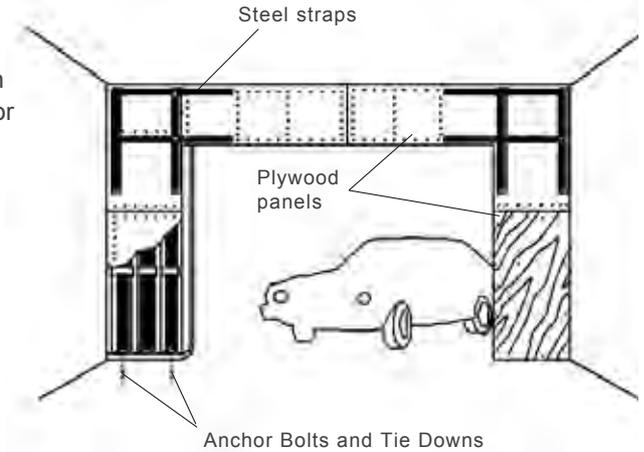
Additional bracing. Home configuration where there is no in-line wall. Additional bracing may be appropriate in this situation.
